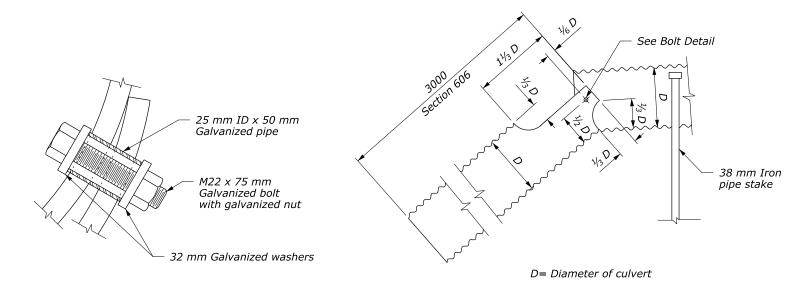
DETAIL APPROVED FOR USE 4/2009 DETAIL W606-10
